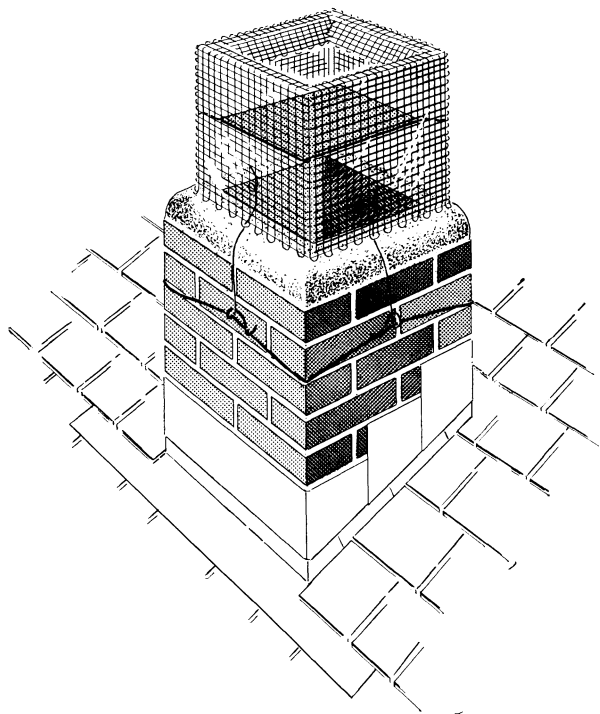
Spark arresters on chimneys prevent sparks from flying out and falling on the roof.
